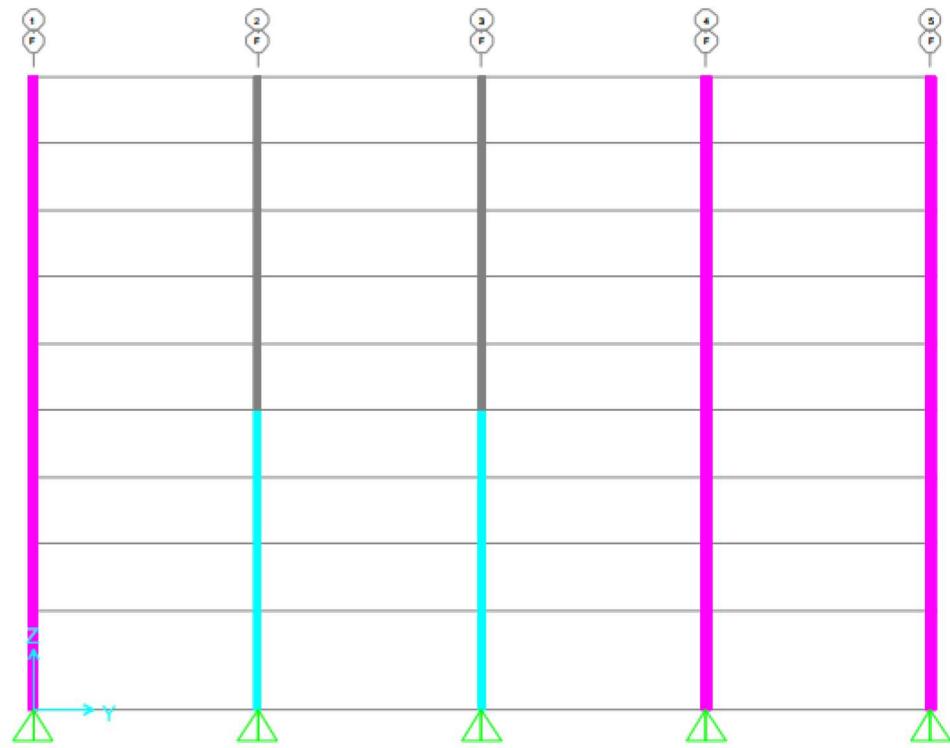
Column cross-section layout in the face F (SAP2000)
